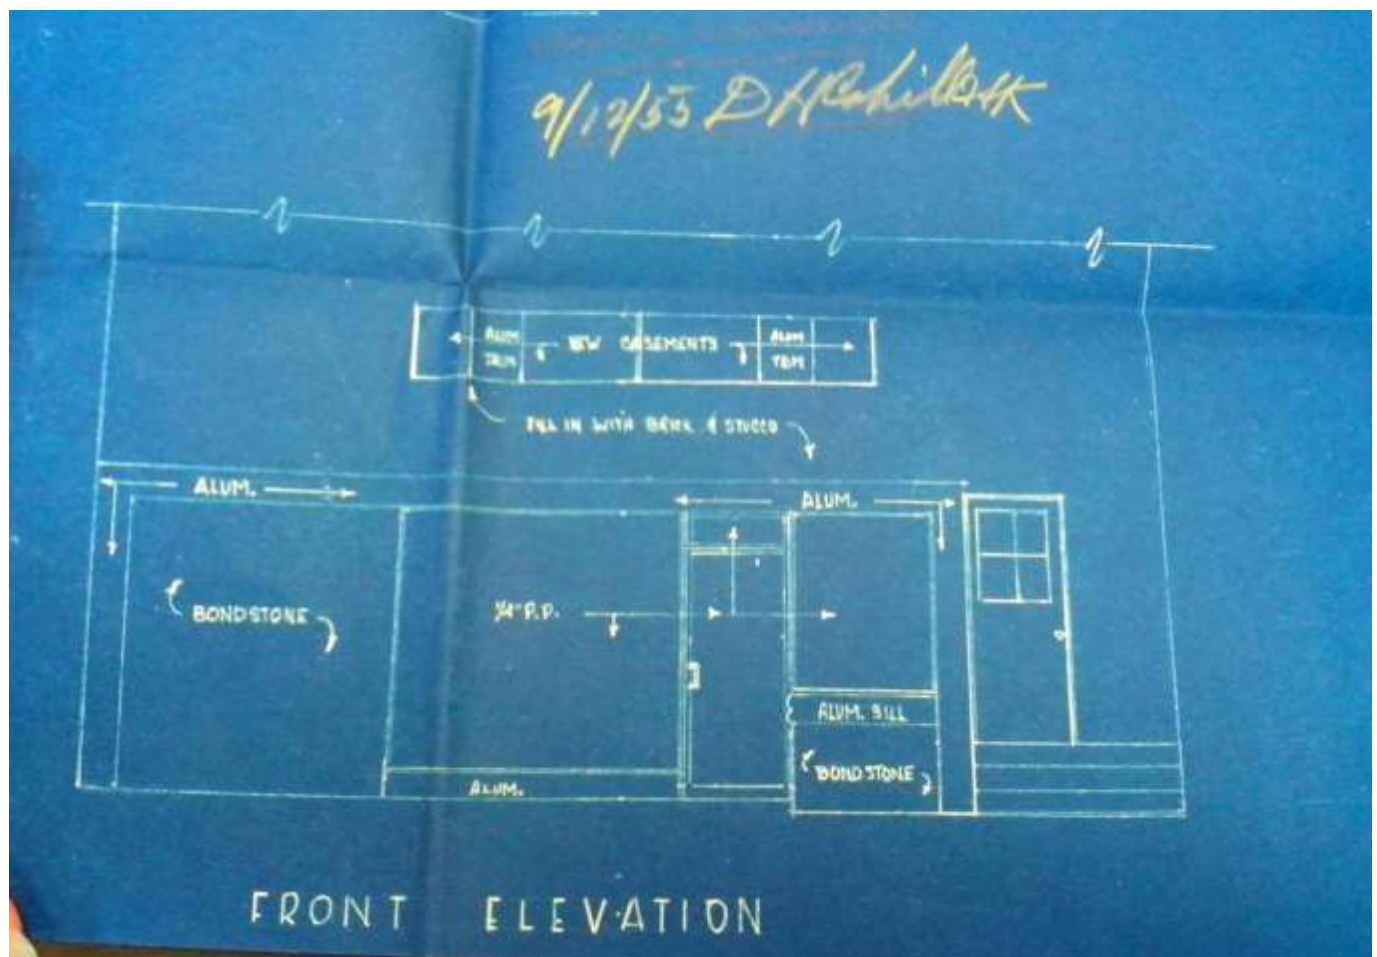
Front elevation "New Store Front, 2402 Mt Vernon Ave., Jerry Berkow Co." In alteration/repair permit #12298 from 12 September 1955. City of Alexandria Archives and Records Center.
